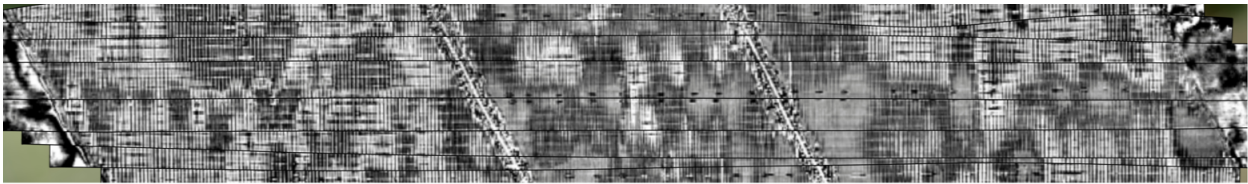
GPR Image Showing Top Steel Condition of Bridge Deck No. 22383
